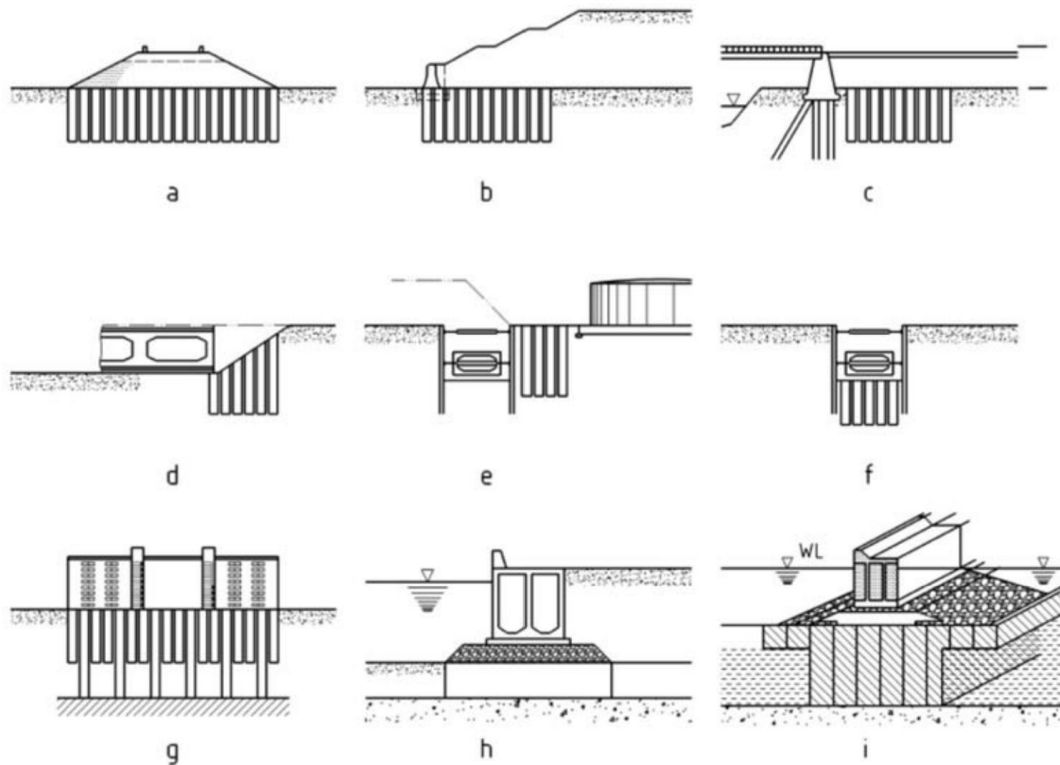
Applications of deep mixing method: a) road embankment; b) fill; c) bridge abutment; d) cut slope; e) nearby constructions; f) braced excavation; g) pile foundation; h) sea wall; i) break water (EN 14679, 2005).
